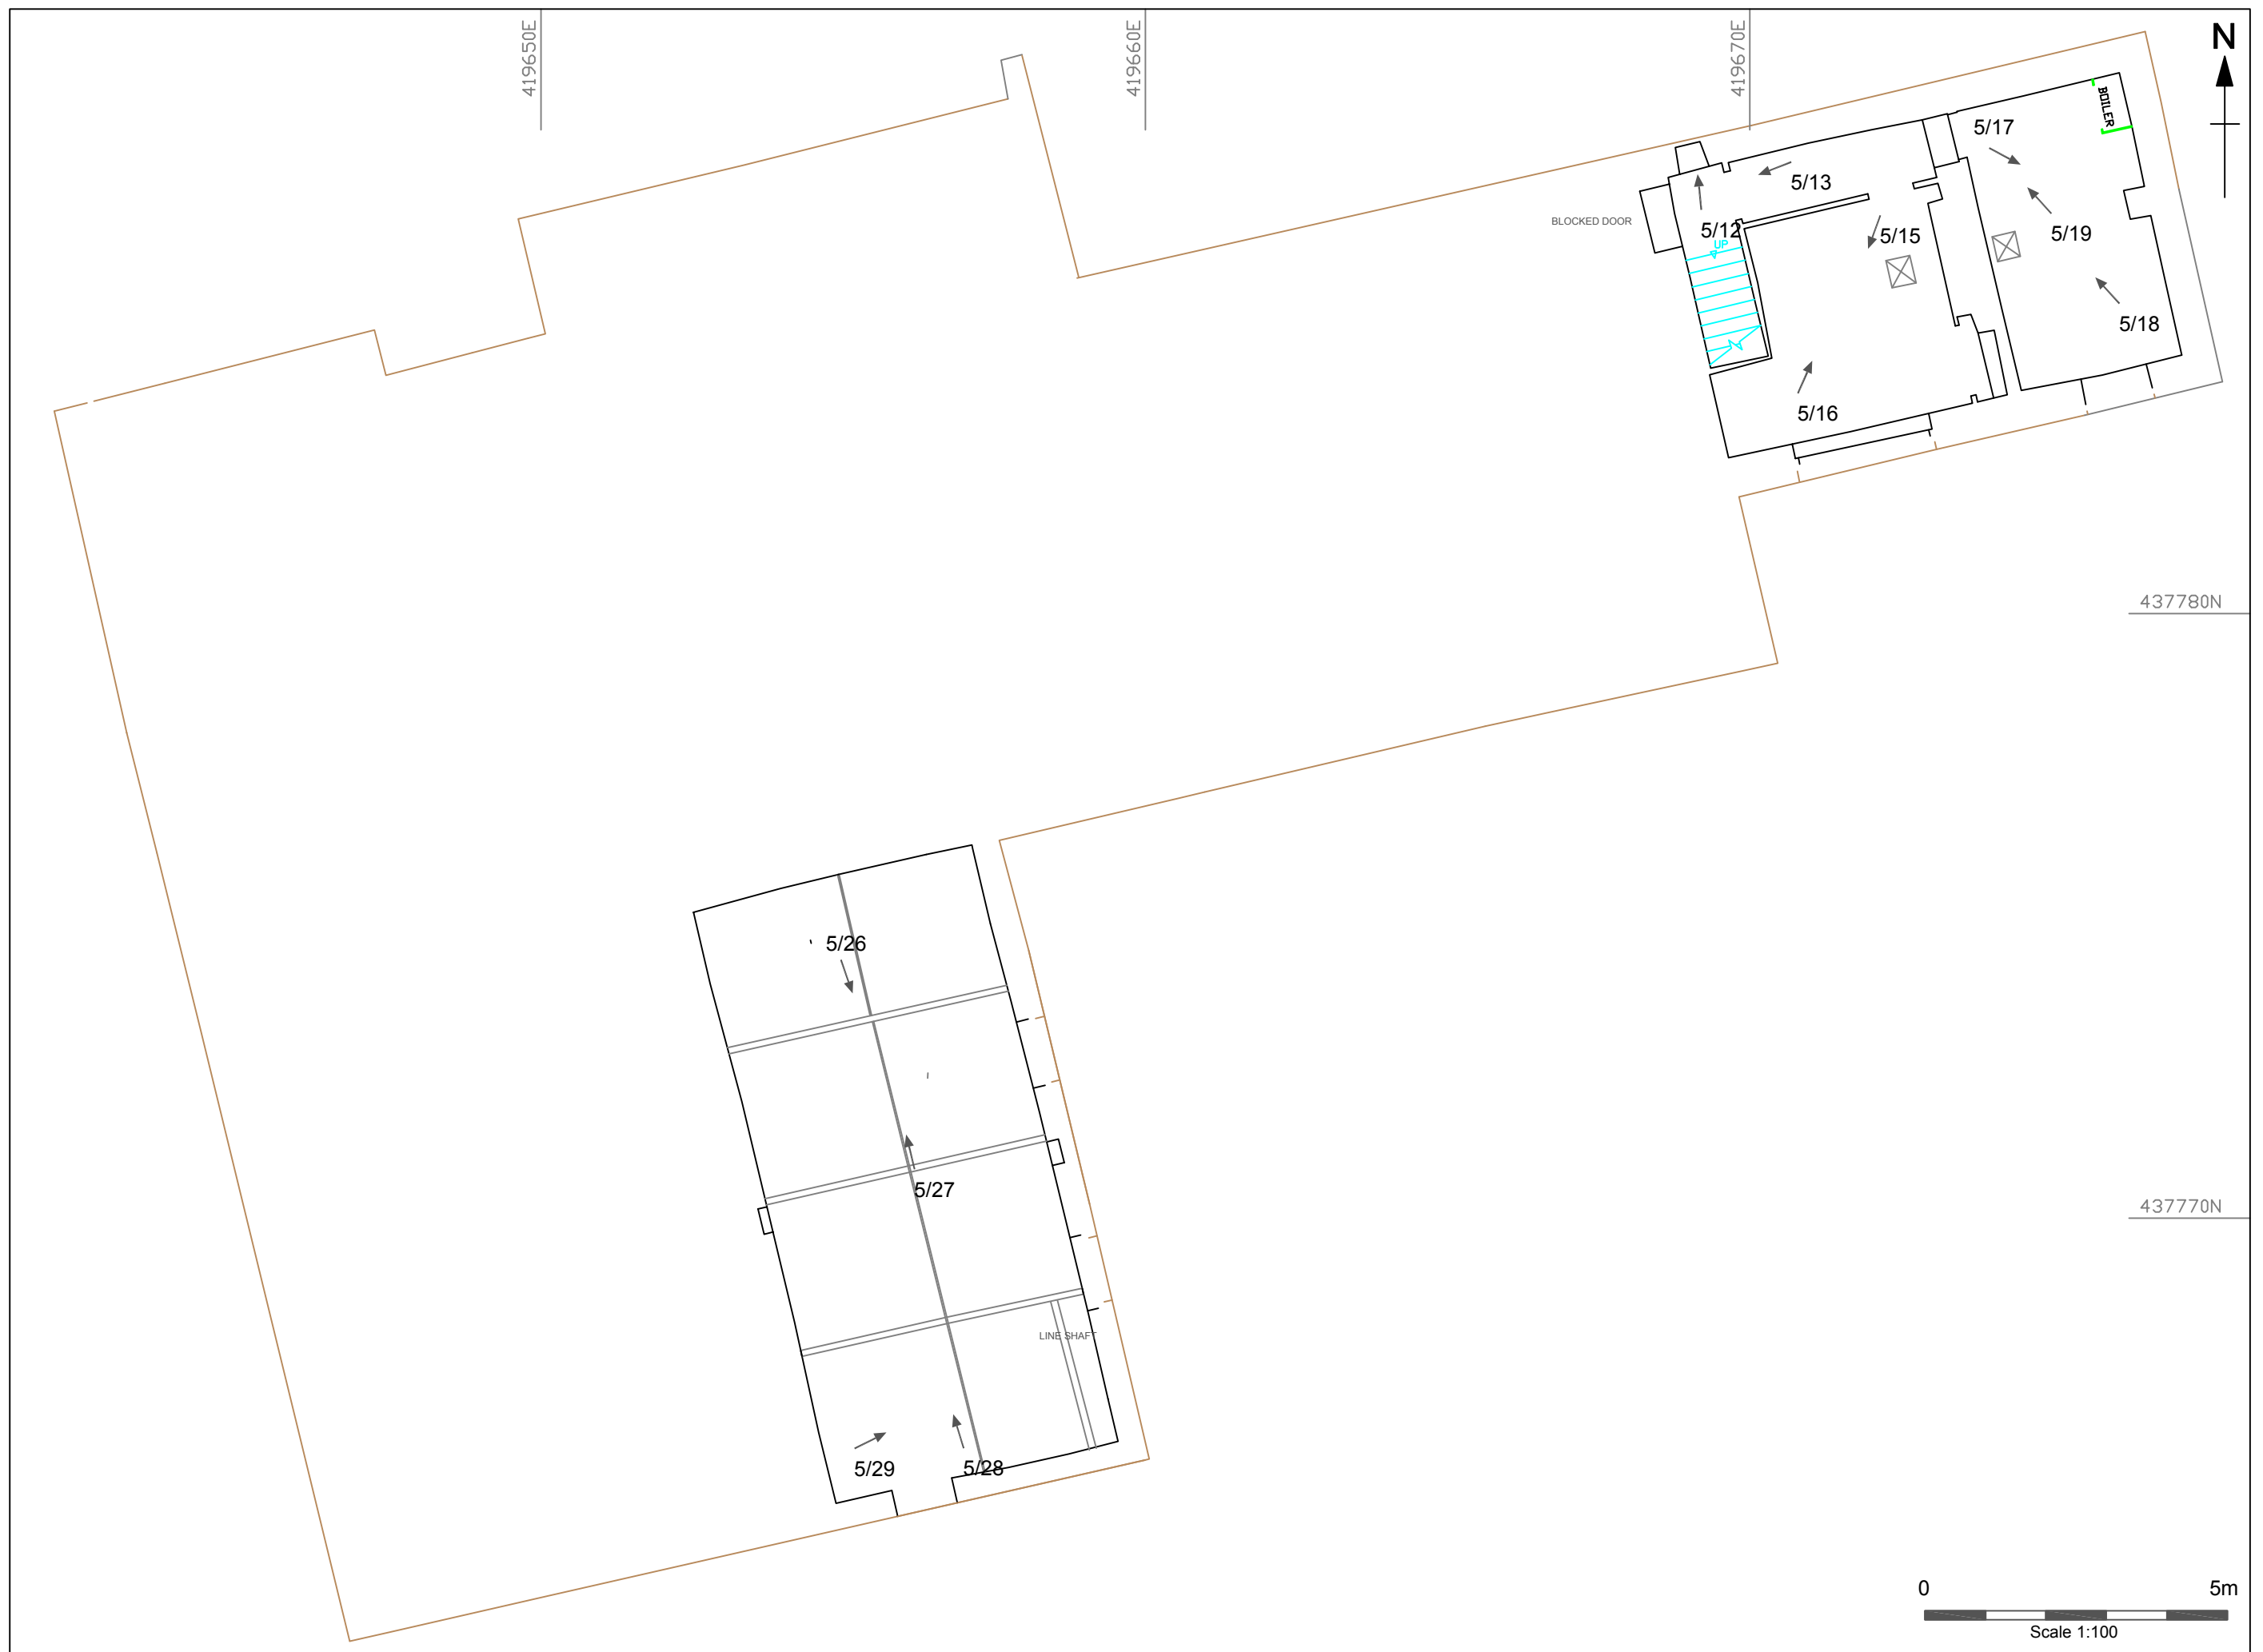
Shaw House Farm: Barn and Cottage First Floor Plan.
